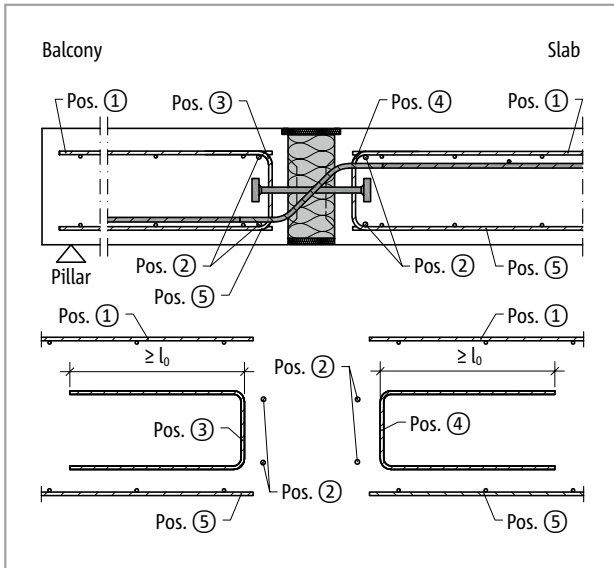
Schöck Isokorb® T type Q-P: On-site reinforcement
